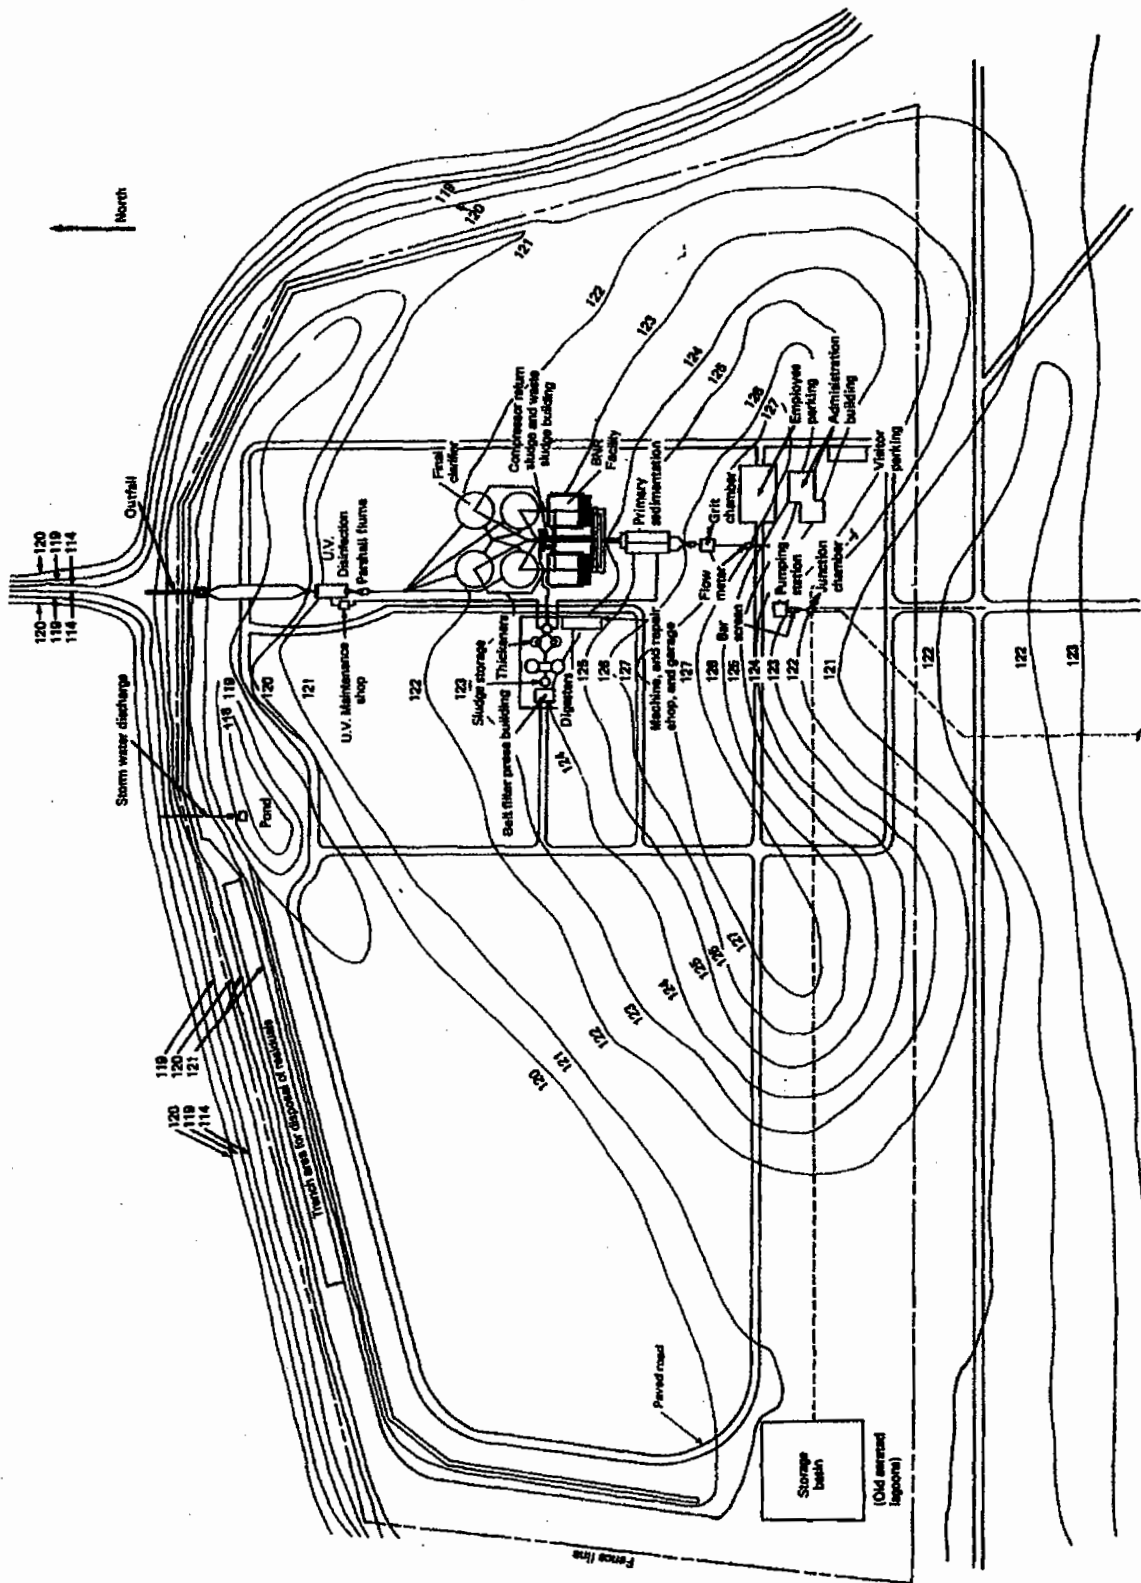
Layout Plan and Final Ground Surface Grade of the Treatment Facility in the Design Example.
